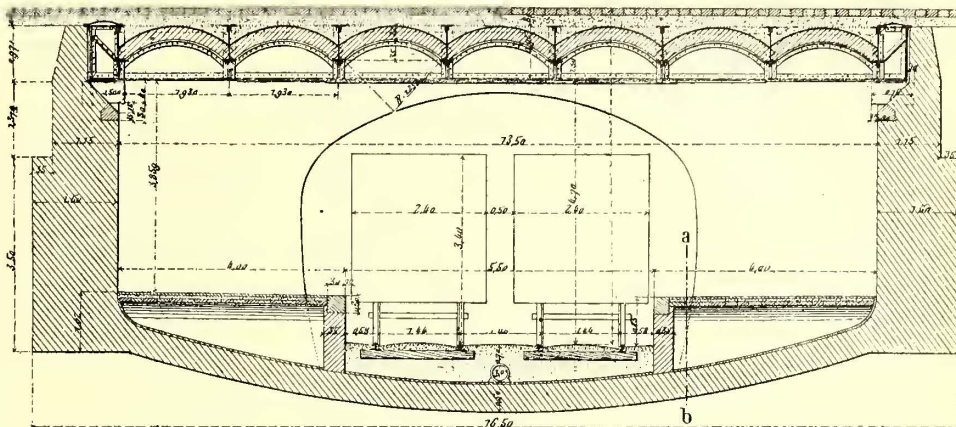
SECTION OF STATION WITH IRON ROOF
